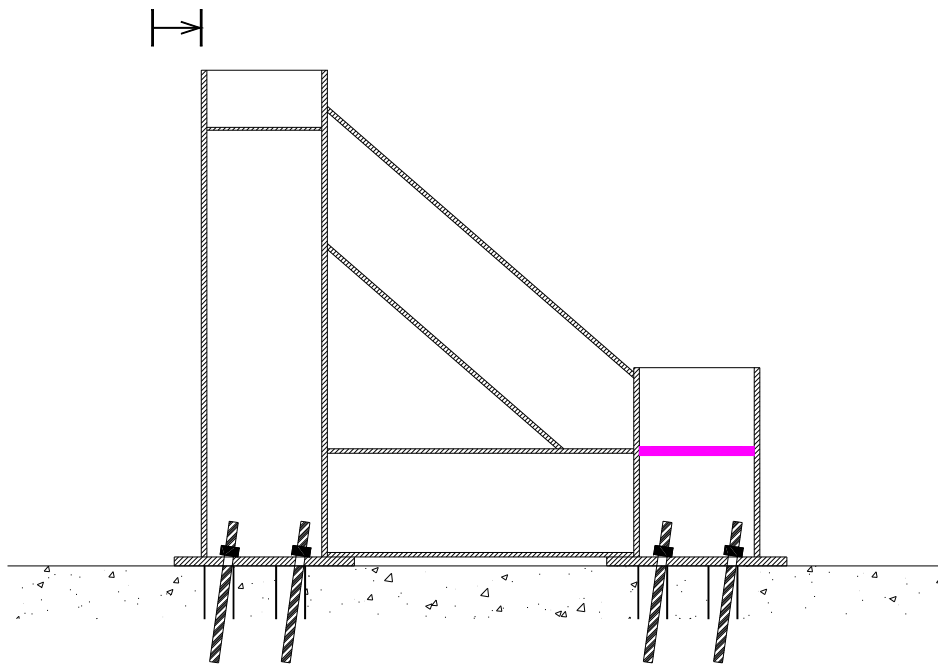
Sketch of Buttresses Sliding Under Prestressing Loads
